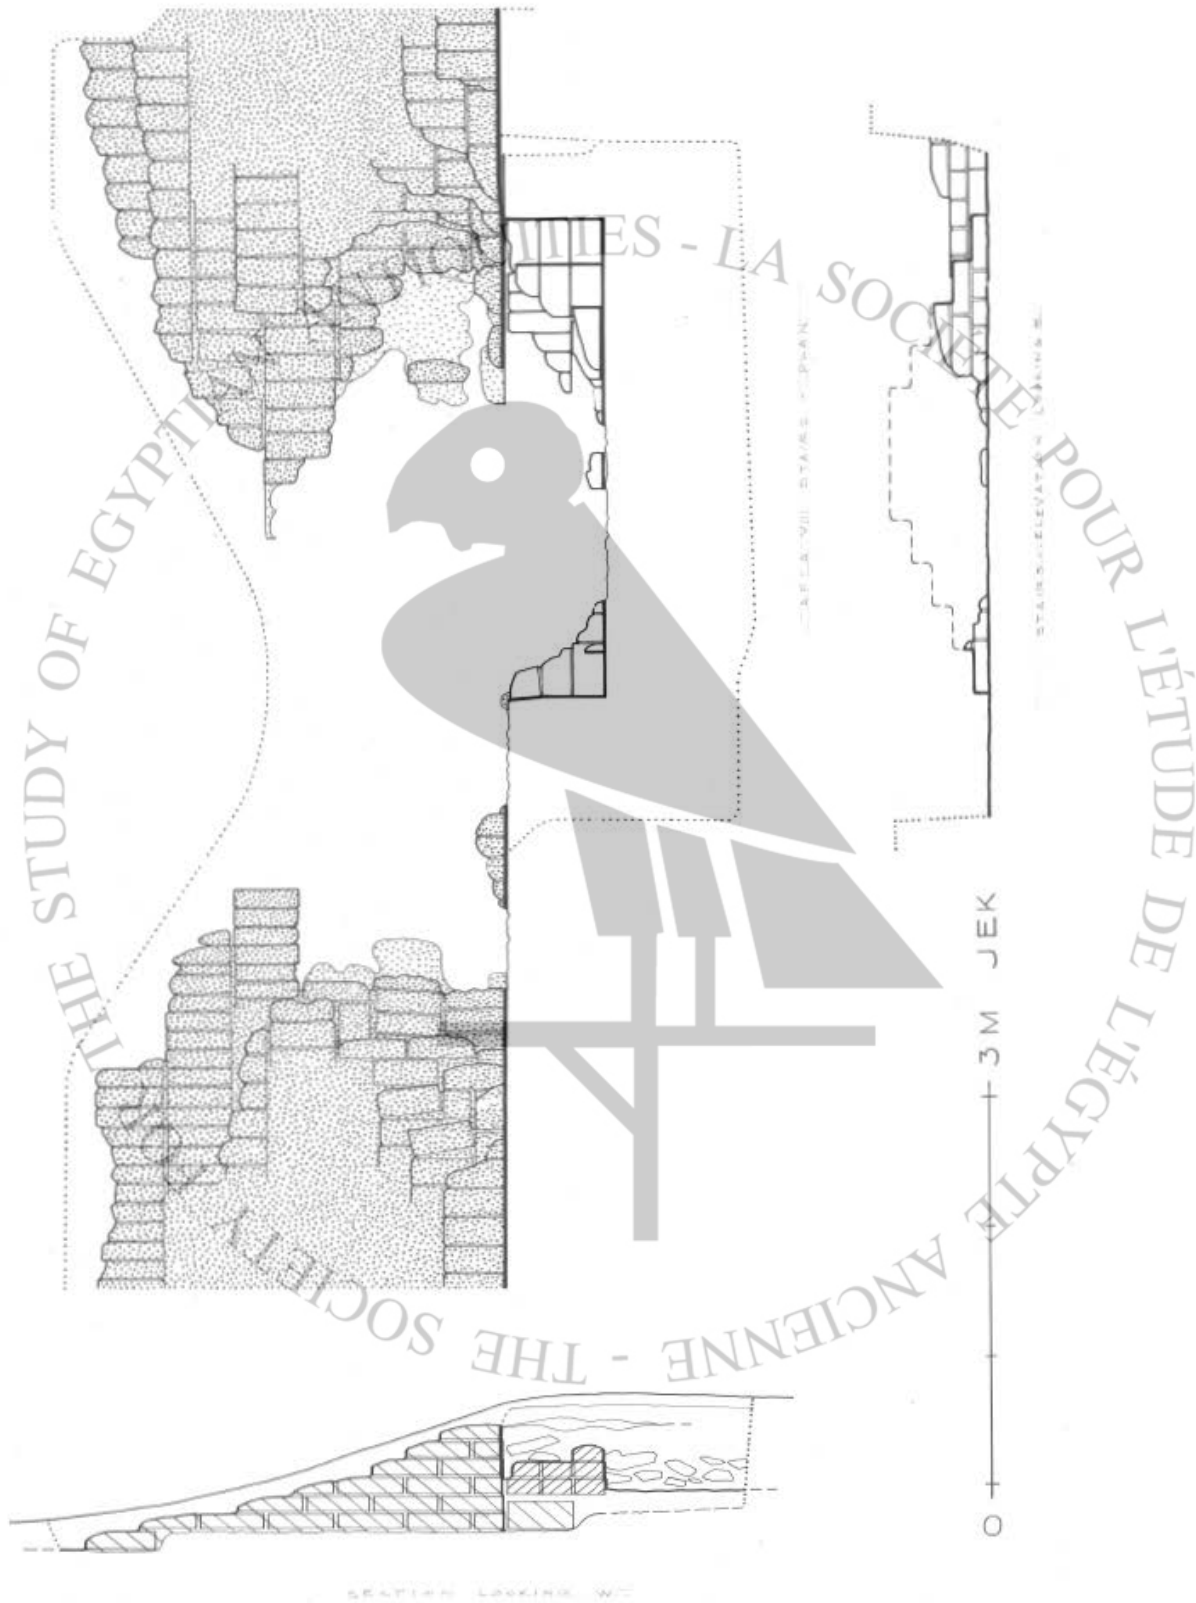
Mansion 4 Exterior Stairs: Plan. On right: Elevation looking S. Below: Section looking W.
